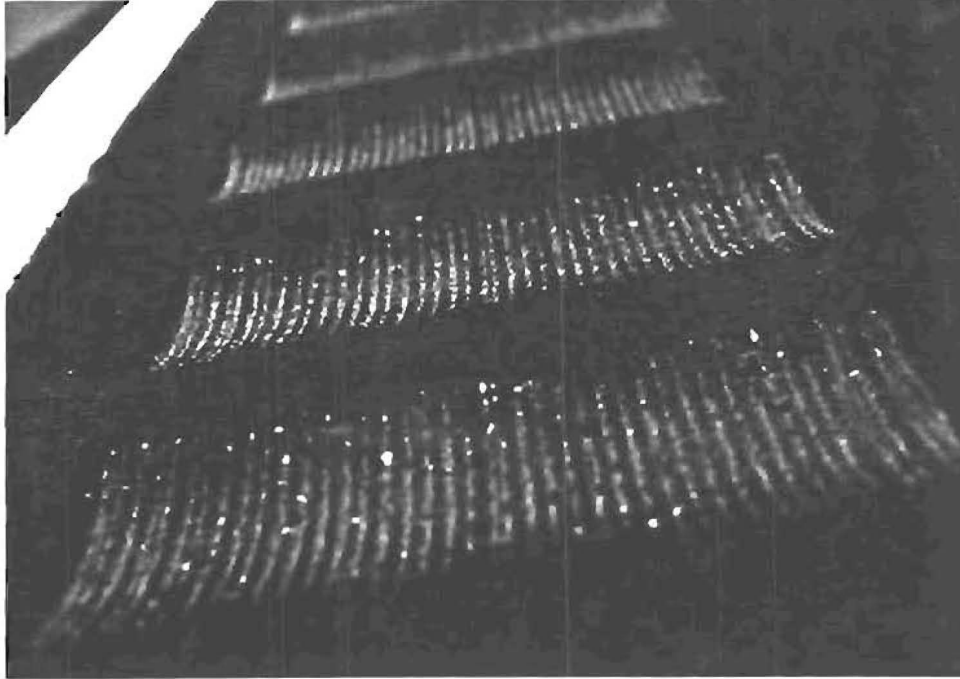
A close-up photograph of the 7 in. wide x 16 in. long x 0.5 in. deep (175 x 400 x 13 mm) Noiseprint™ milled-in-groove on 12 in. (25 mm) centers. (The milled-in strips were cut by and the photograph provided courtesy of surface preparation Technologies, Inc., of Mechanicsburg, PA)
